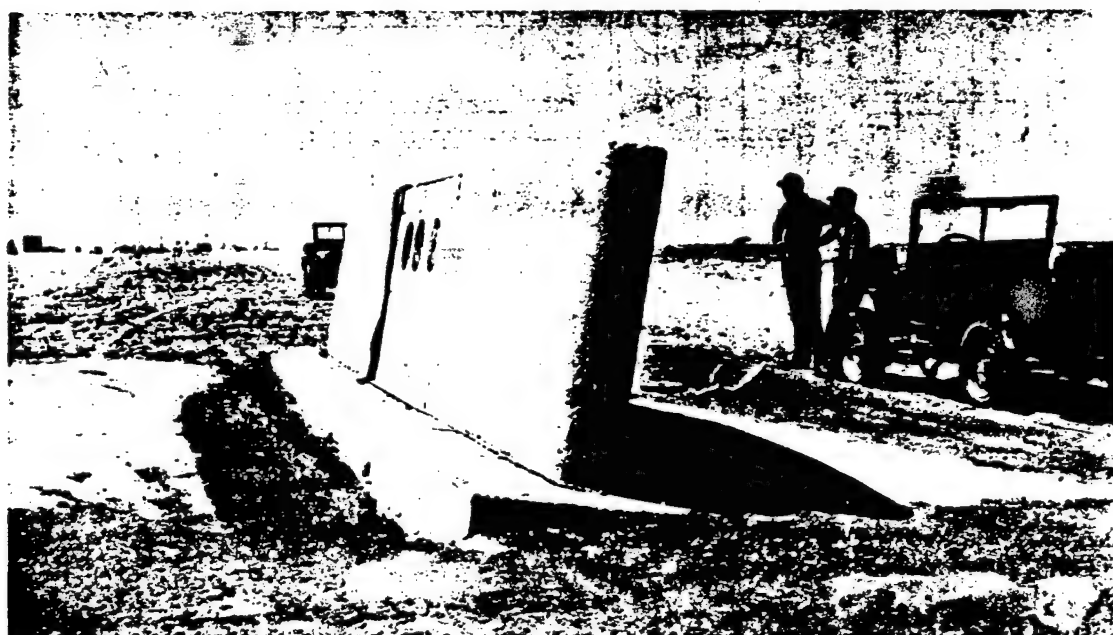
Inclined Wall and Foundation, Runit (Station 20c)
